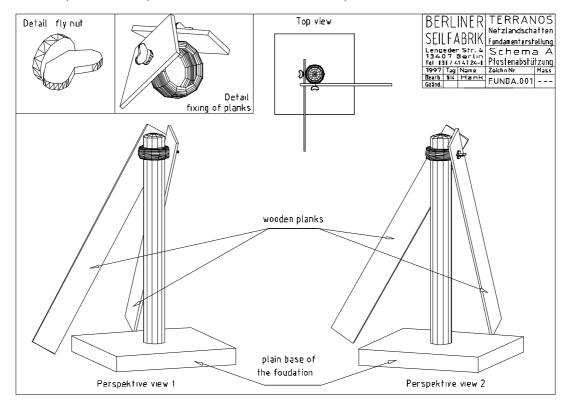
Schematic diagram depicting how to stabilise the foundation posts with wooden planks.
